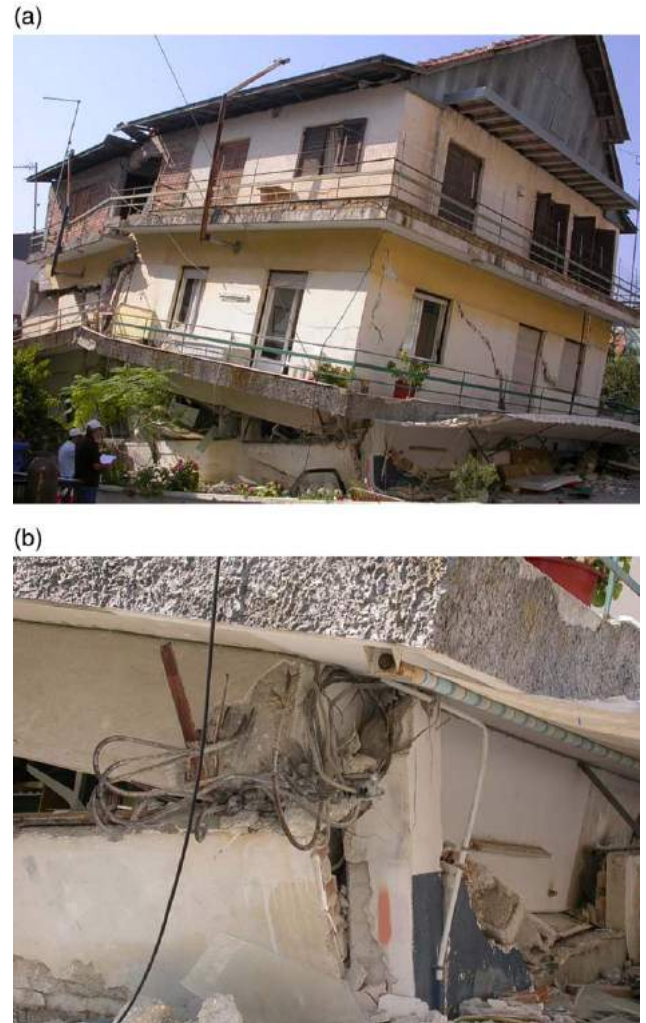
(a) Collapse of poorly designed R/C building in the town of Lefkada; (b) detail of corner column, with lack of stirrups.
